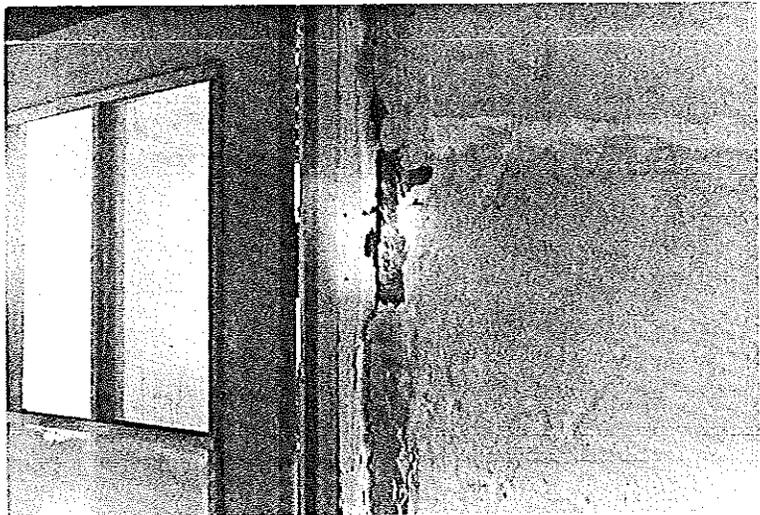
Interior plaster cracking of a partition wall.
